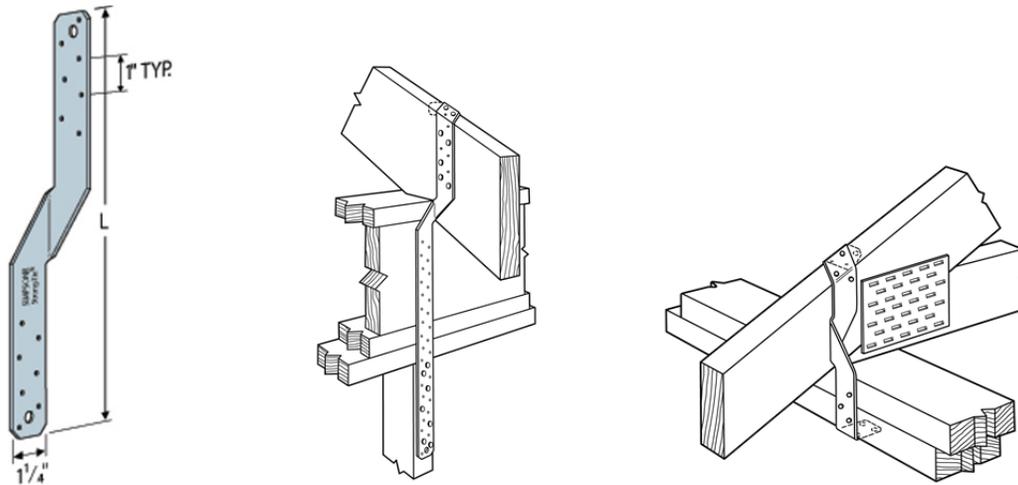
MTS TWIST STRAP AND TYPICAL INSTALLATIONS
